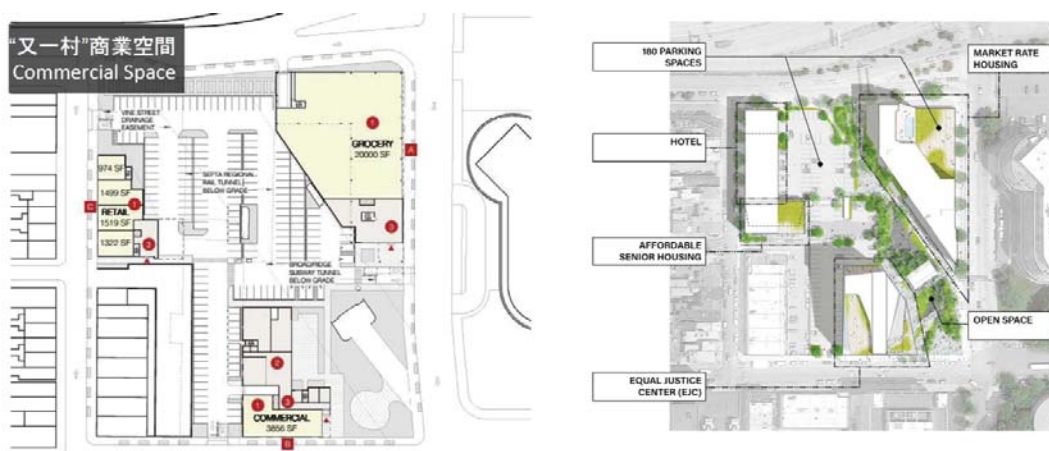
Parkway Plan by Cecil Baker (Left). Pennrose Plan by WRT(Right)
